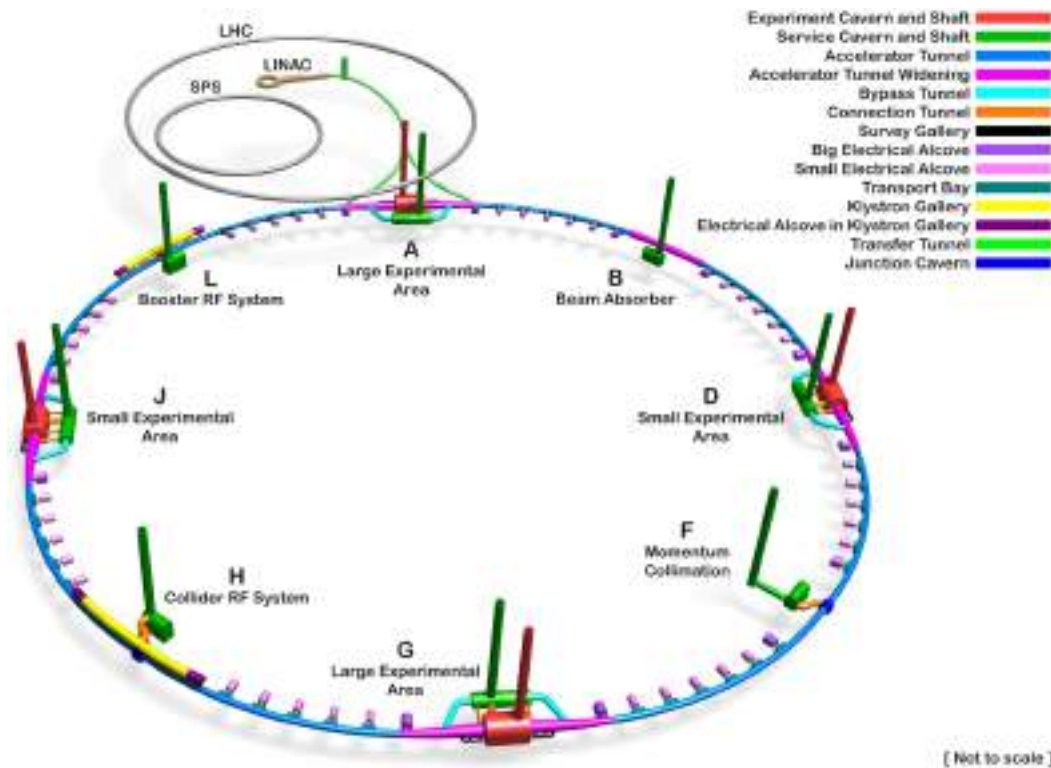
Schematic layout of FCC-ee underground civil engineering
